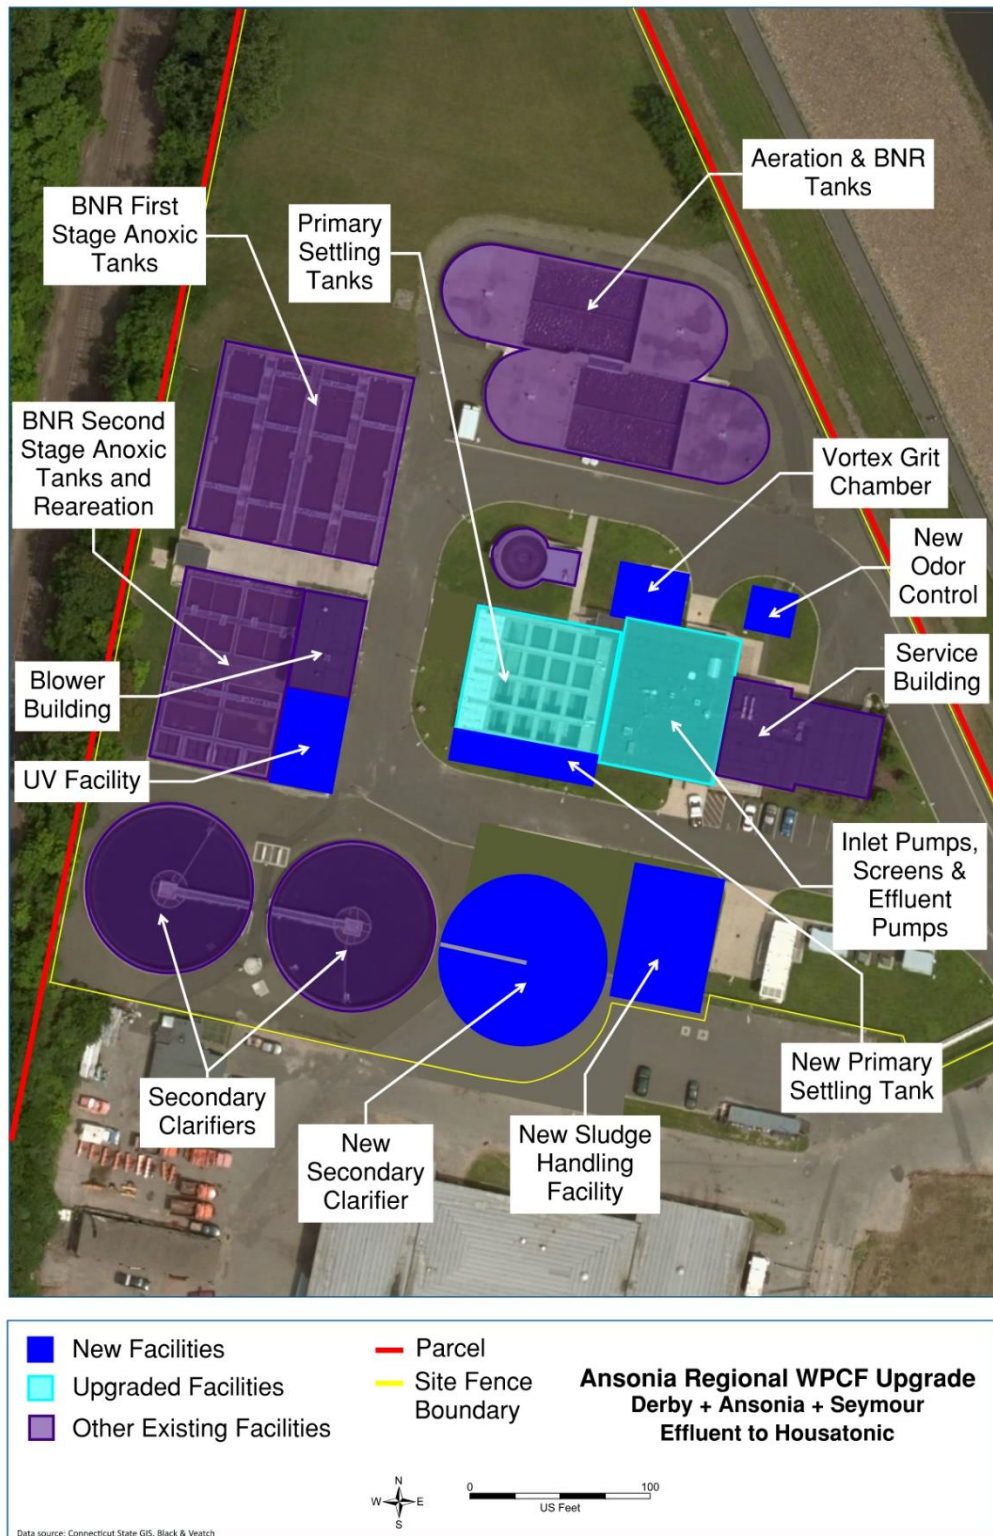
Proposed Ansonia WPCF Site Plan - Recommended Regional Alternative 5B
